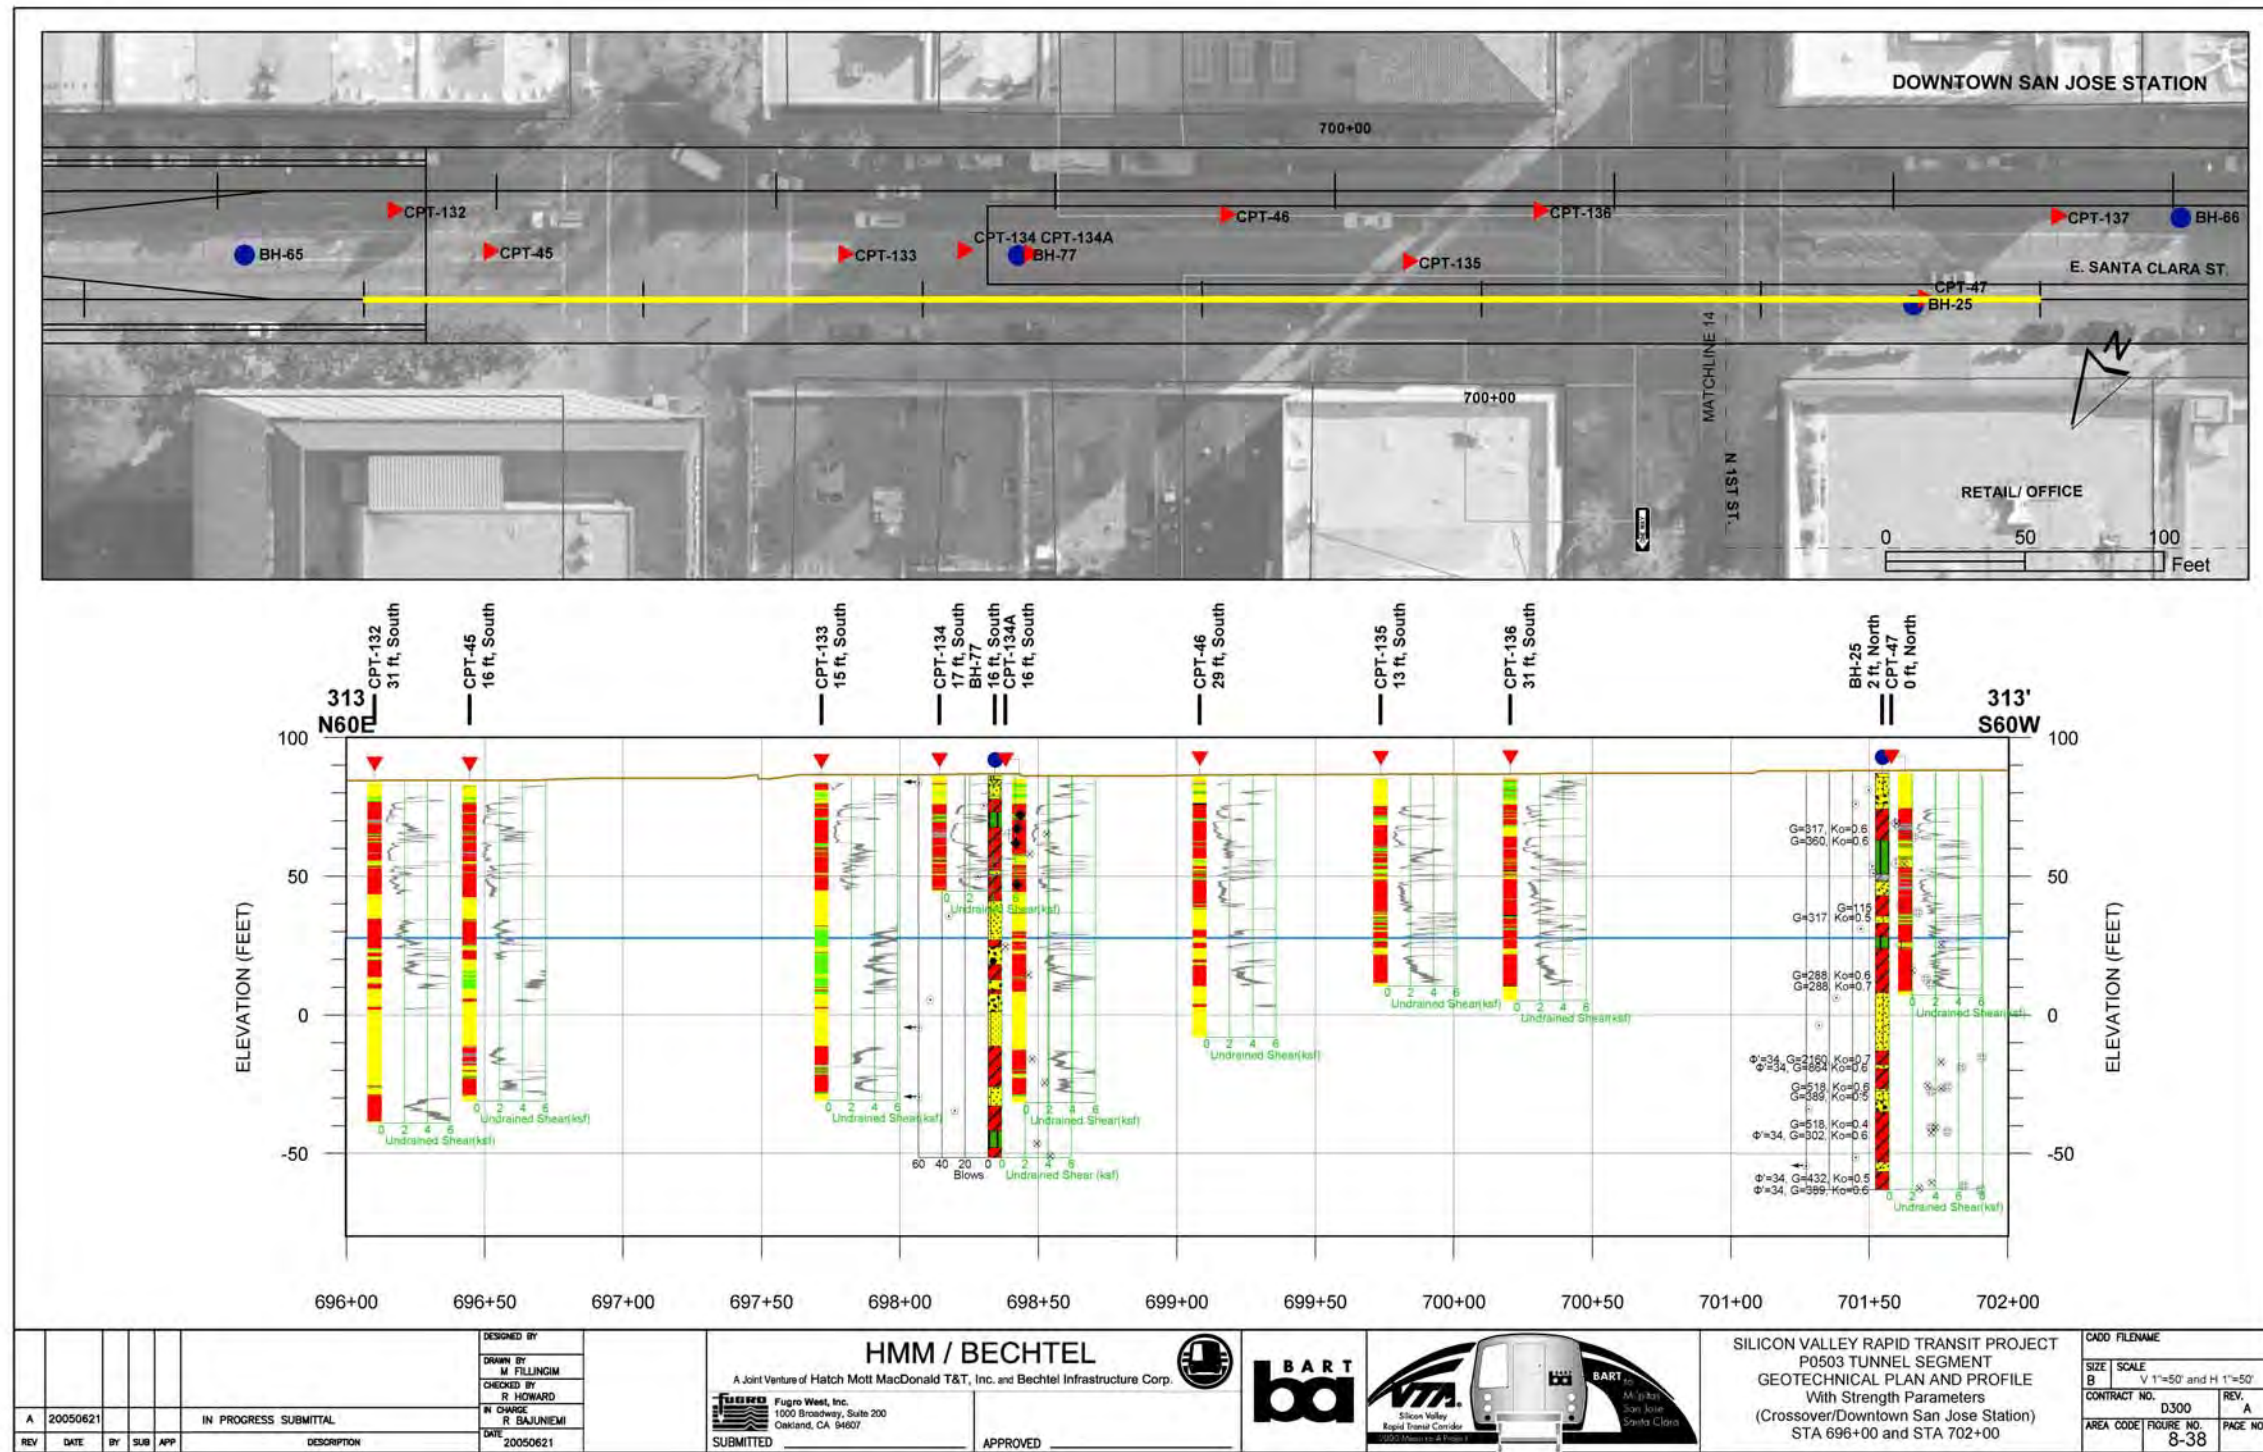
Geotechnical Plan and Profile with Strength Parameters: 696+00 to 702+00.
